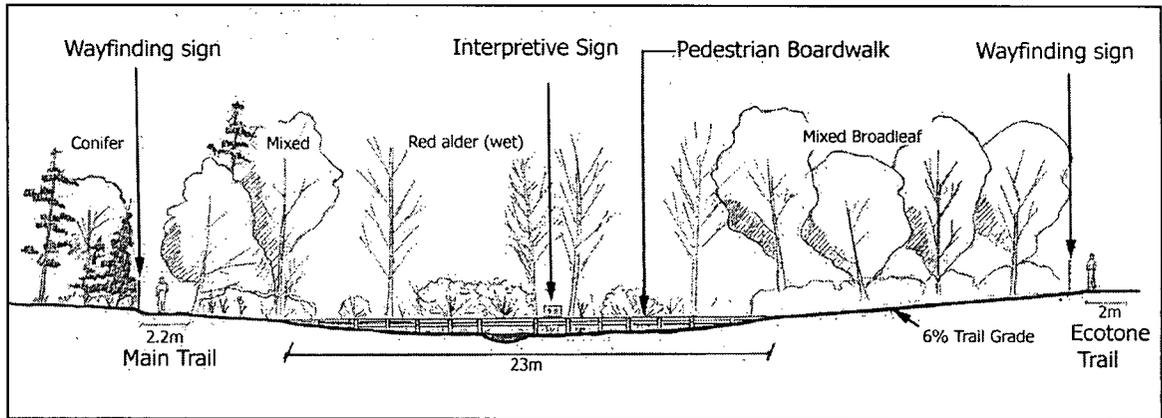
7 Beaver Dam Interpretation Area North Elevation. Scale 1:400
